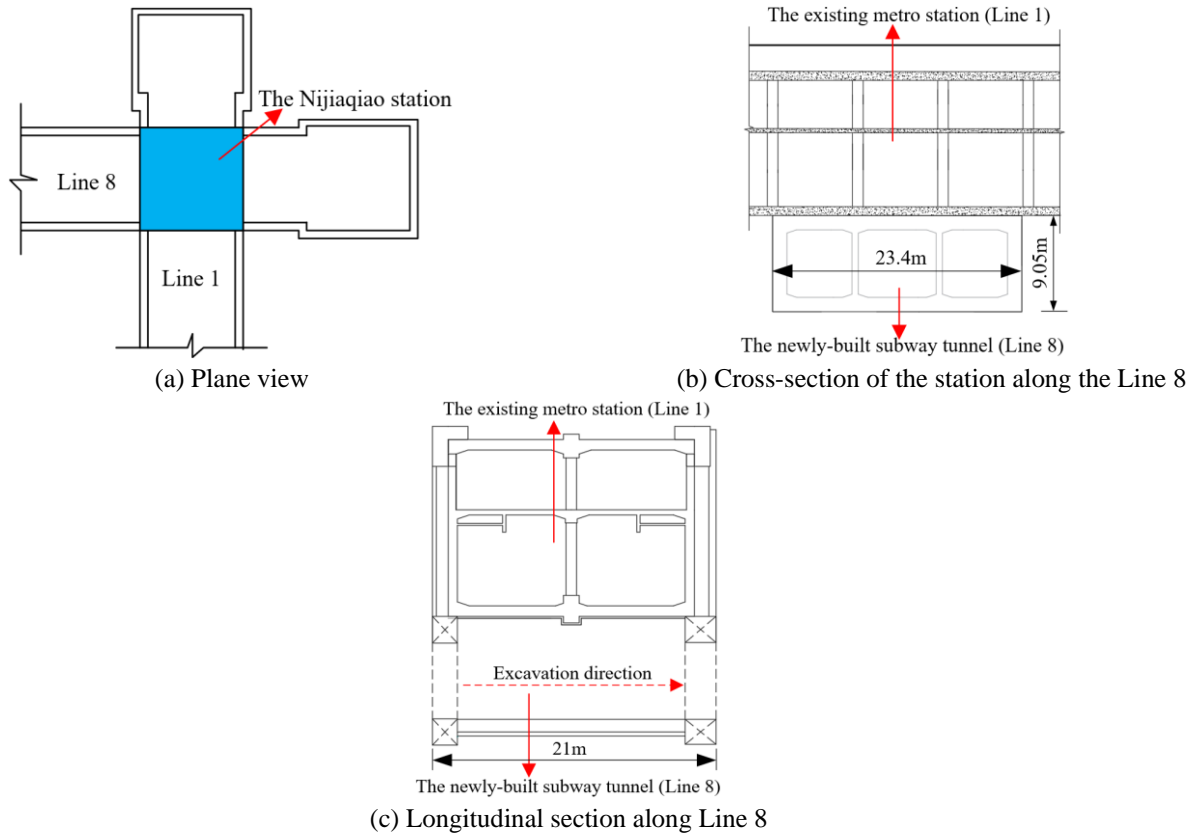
The relative position of the newly-built subway tunnel and the existing metro station
